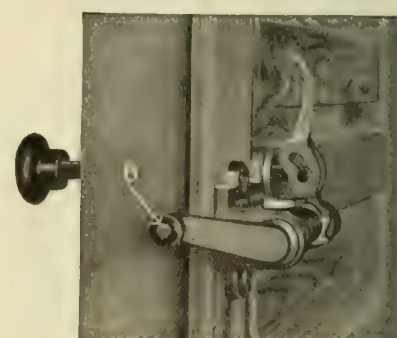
Fig. A shows how flat closure is secured; also, how Stevenson door-frame set in wall. Opening in wall should be 3 1/2" wider and 4 1/2" higher than clear size of doorway. (Follow construction Nos. 1 and 2.) Overhead track doors require a wall opening extending 11" above upper edge of track. Door-frames are secured with fig. screws 3/4" x 4" inserted through front casing at A. Set door-frame to conform to door, not to wall.
